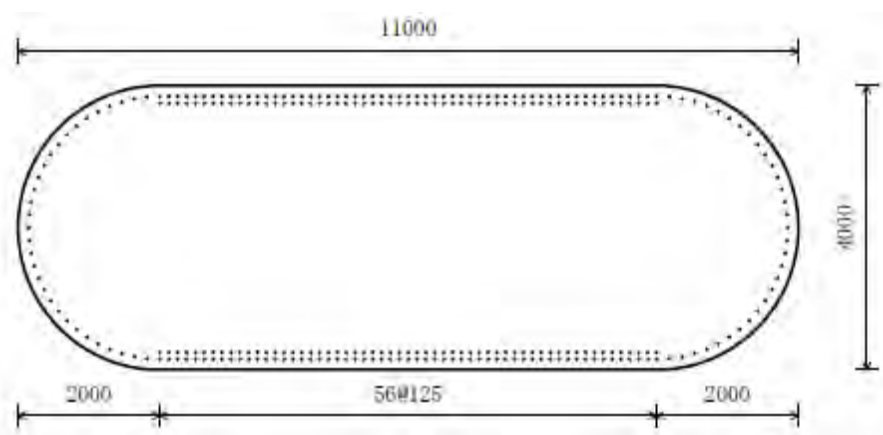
Rebar Arrangement (Main Reinforcement)
